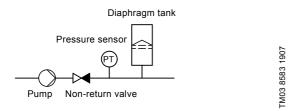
Position of the non-return valve and pressure sensor in system with positive inlet pressure
